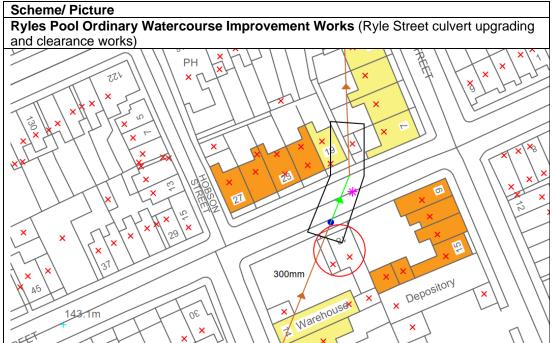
Site Location Plan showing the route of the culvert underneath Ryle Street / Hobson Street (culvert flows from south to north)
